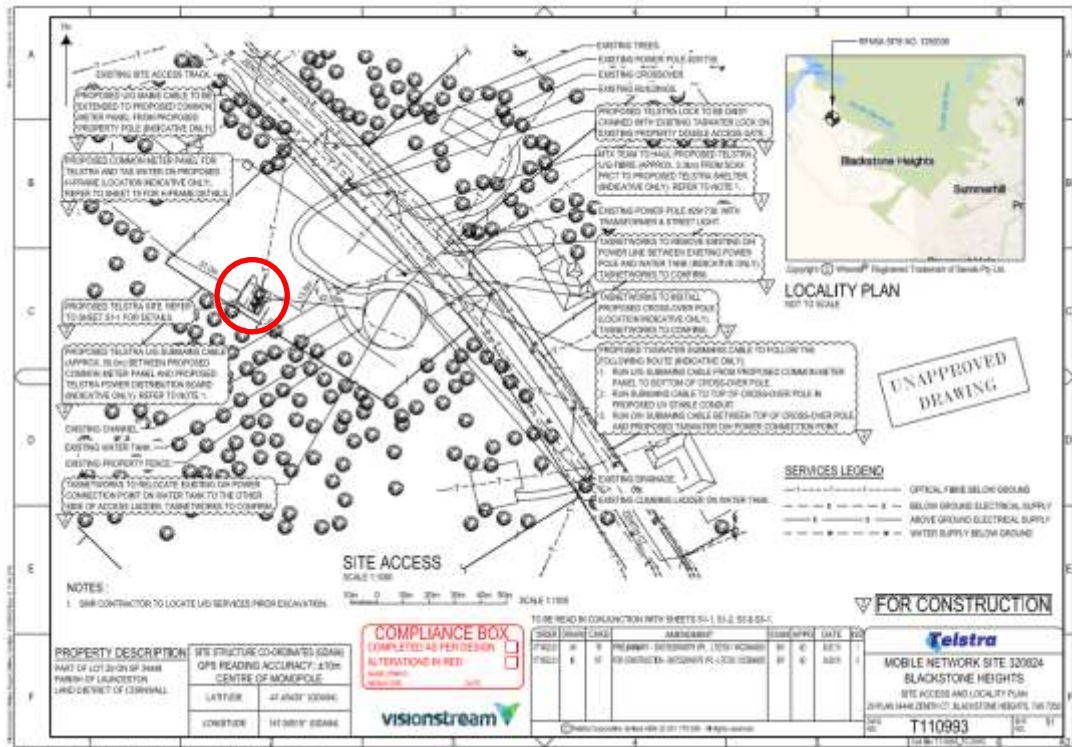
Site plan showing the location of the proposed telecommunication facility (circled in red)
